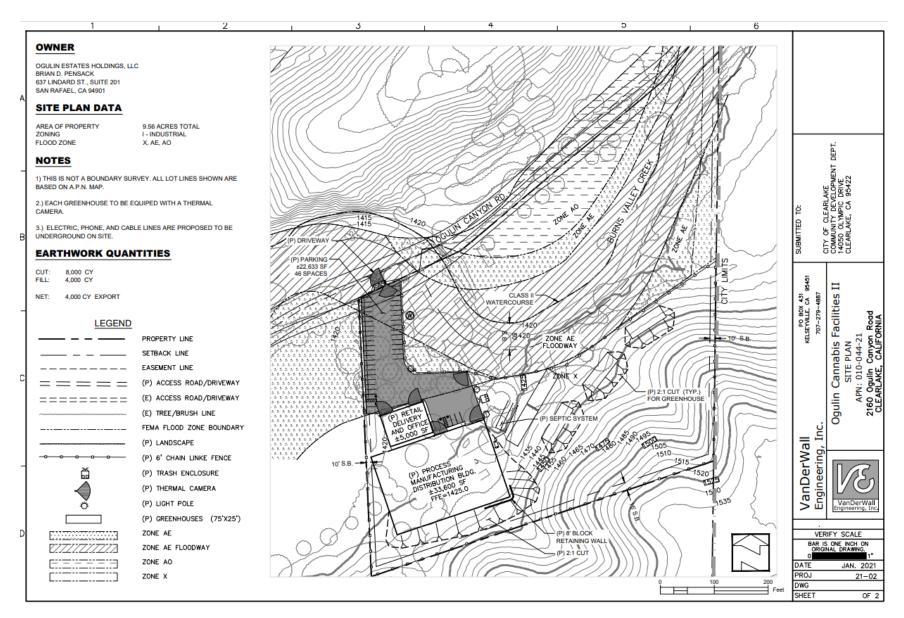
Site Plan for the proposed project at APN 010-044-21.
